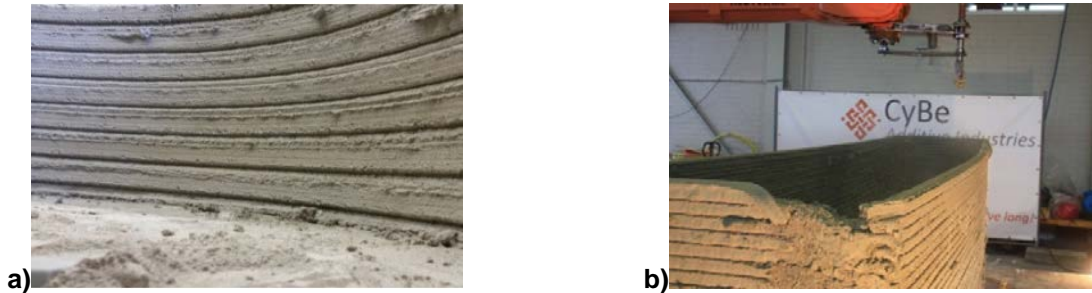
Typical 3D printing defects on the example of concrete wall by 'CyBe Additive Industries' (Holland) [13]: a) disruption of the geometrical dimensions, concrete flows b) destruction of the concrete product due to the low structural strength of the concrete mix.
